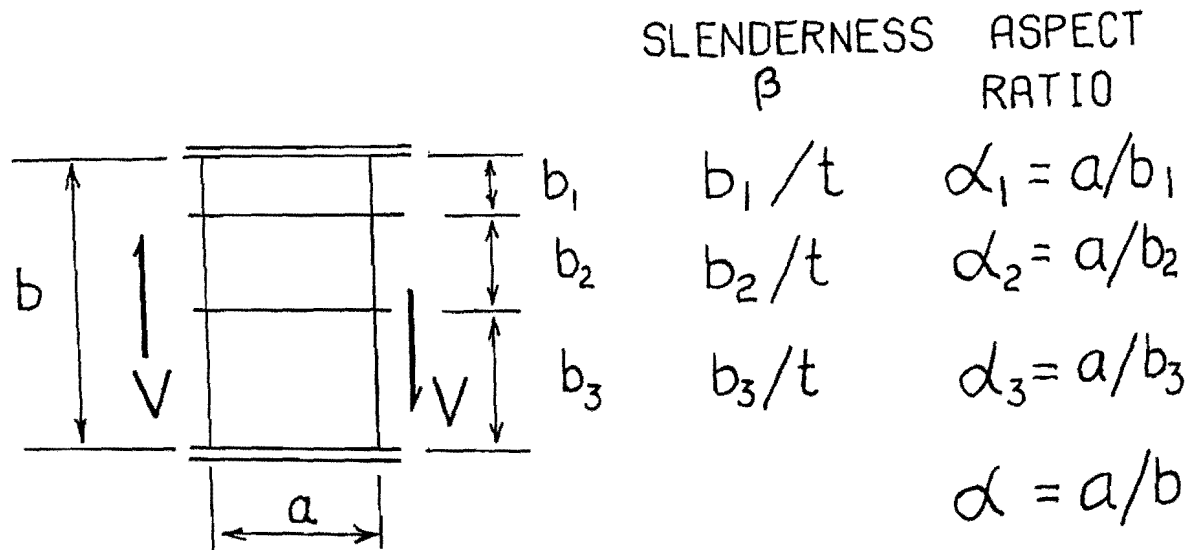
PLATE GIRDER SEGMENT WITH LONGITUDINAL STIFFENERS
